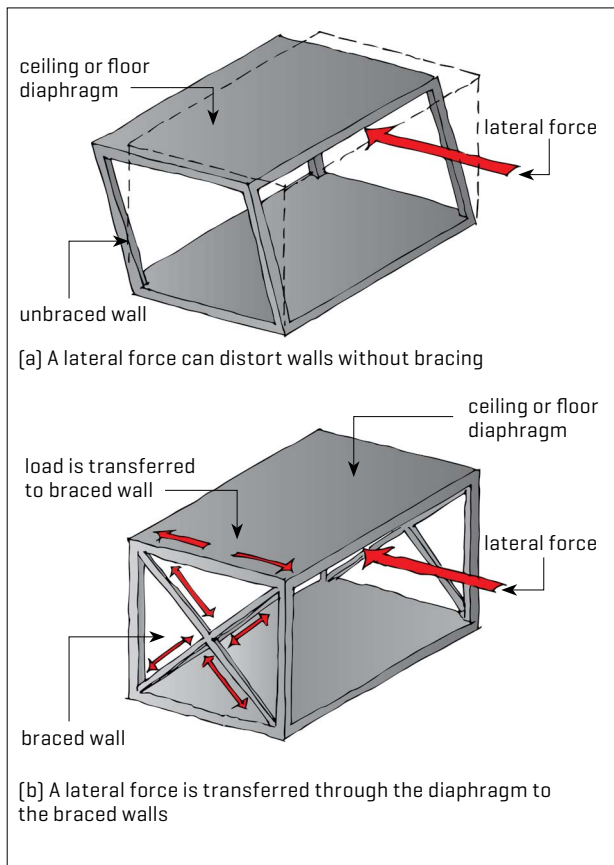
Load transfer through ceiling diaphragm to braced wall.
